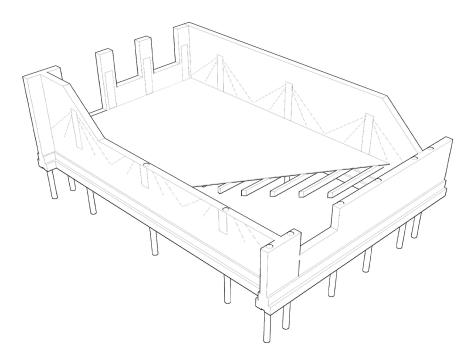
Illustration of the span cable jack down concept design (by author).
